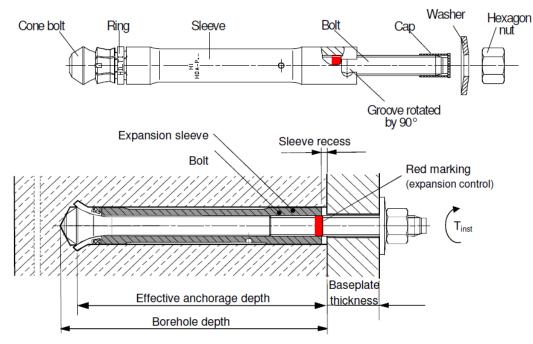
Pre-setting HDA-P and HDA-PR Anchors (Pre-setting)
